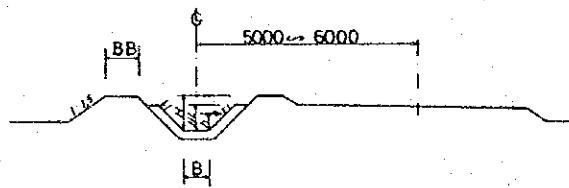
PLAN AND PROFILE OF WSC-3 (1/2)
